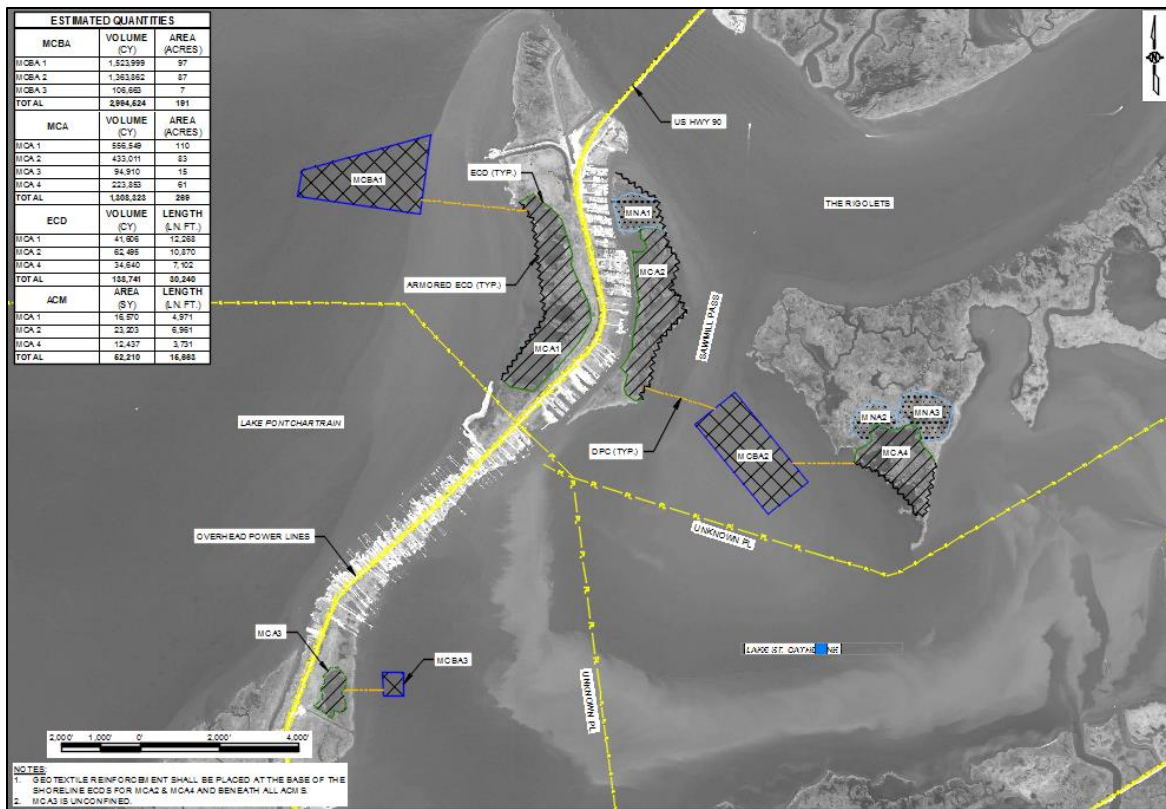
95% Design Plan View of the Proposed PO-0169 Project Design Features
